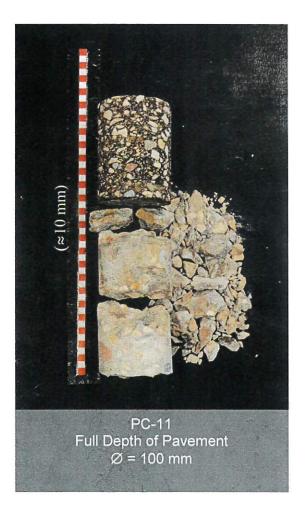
Specimen from Ellice Avenue, Westbound Curb Lane
